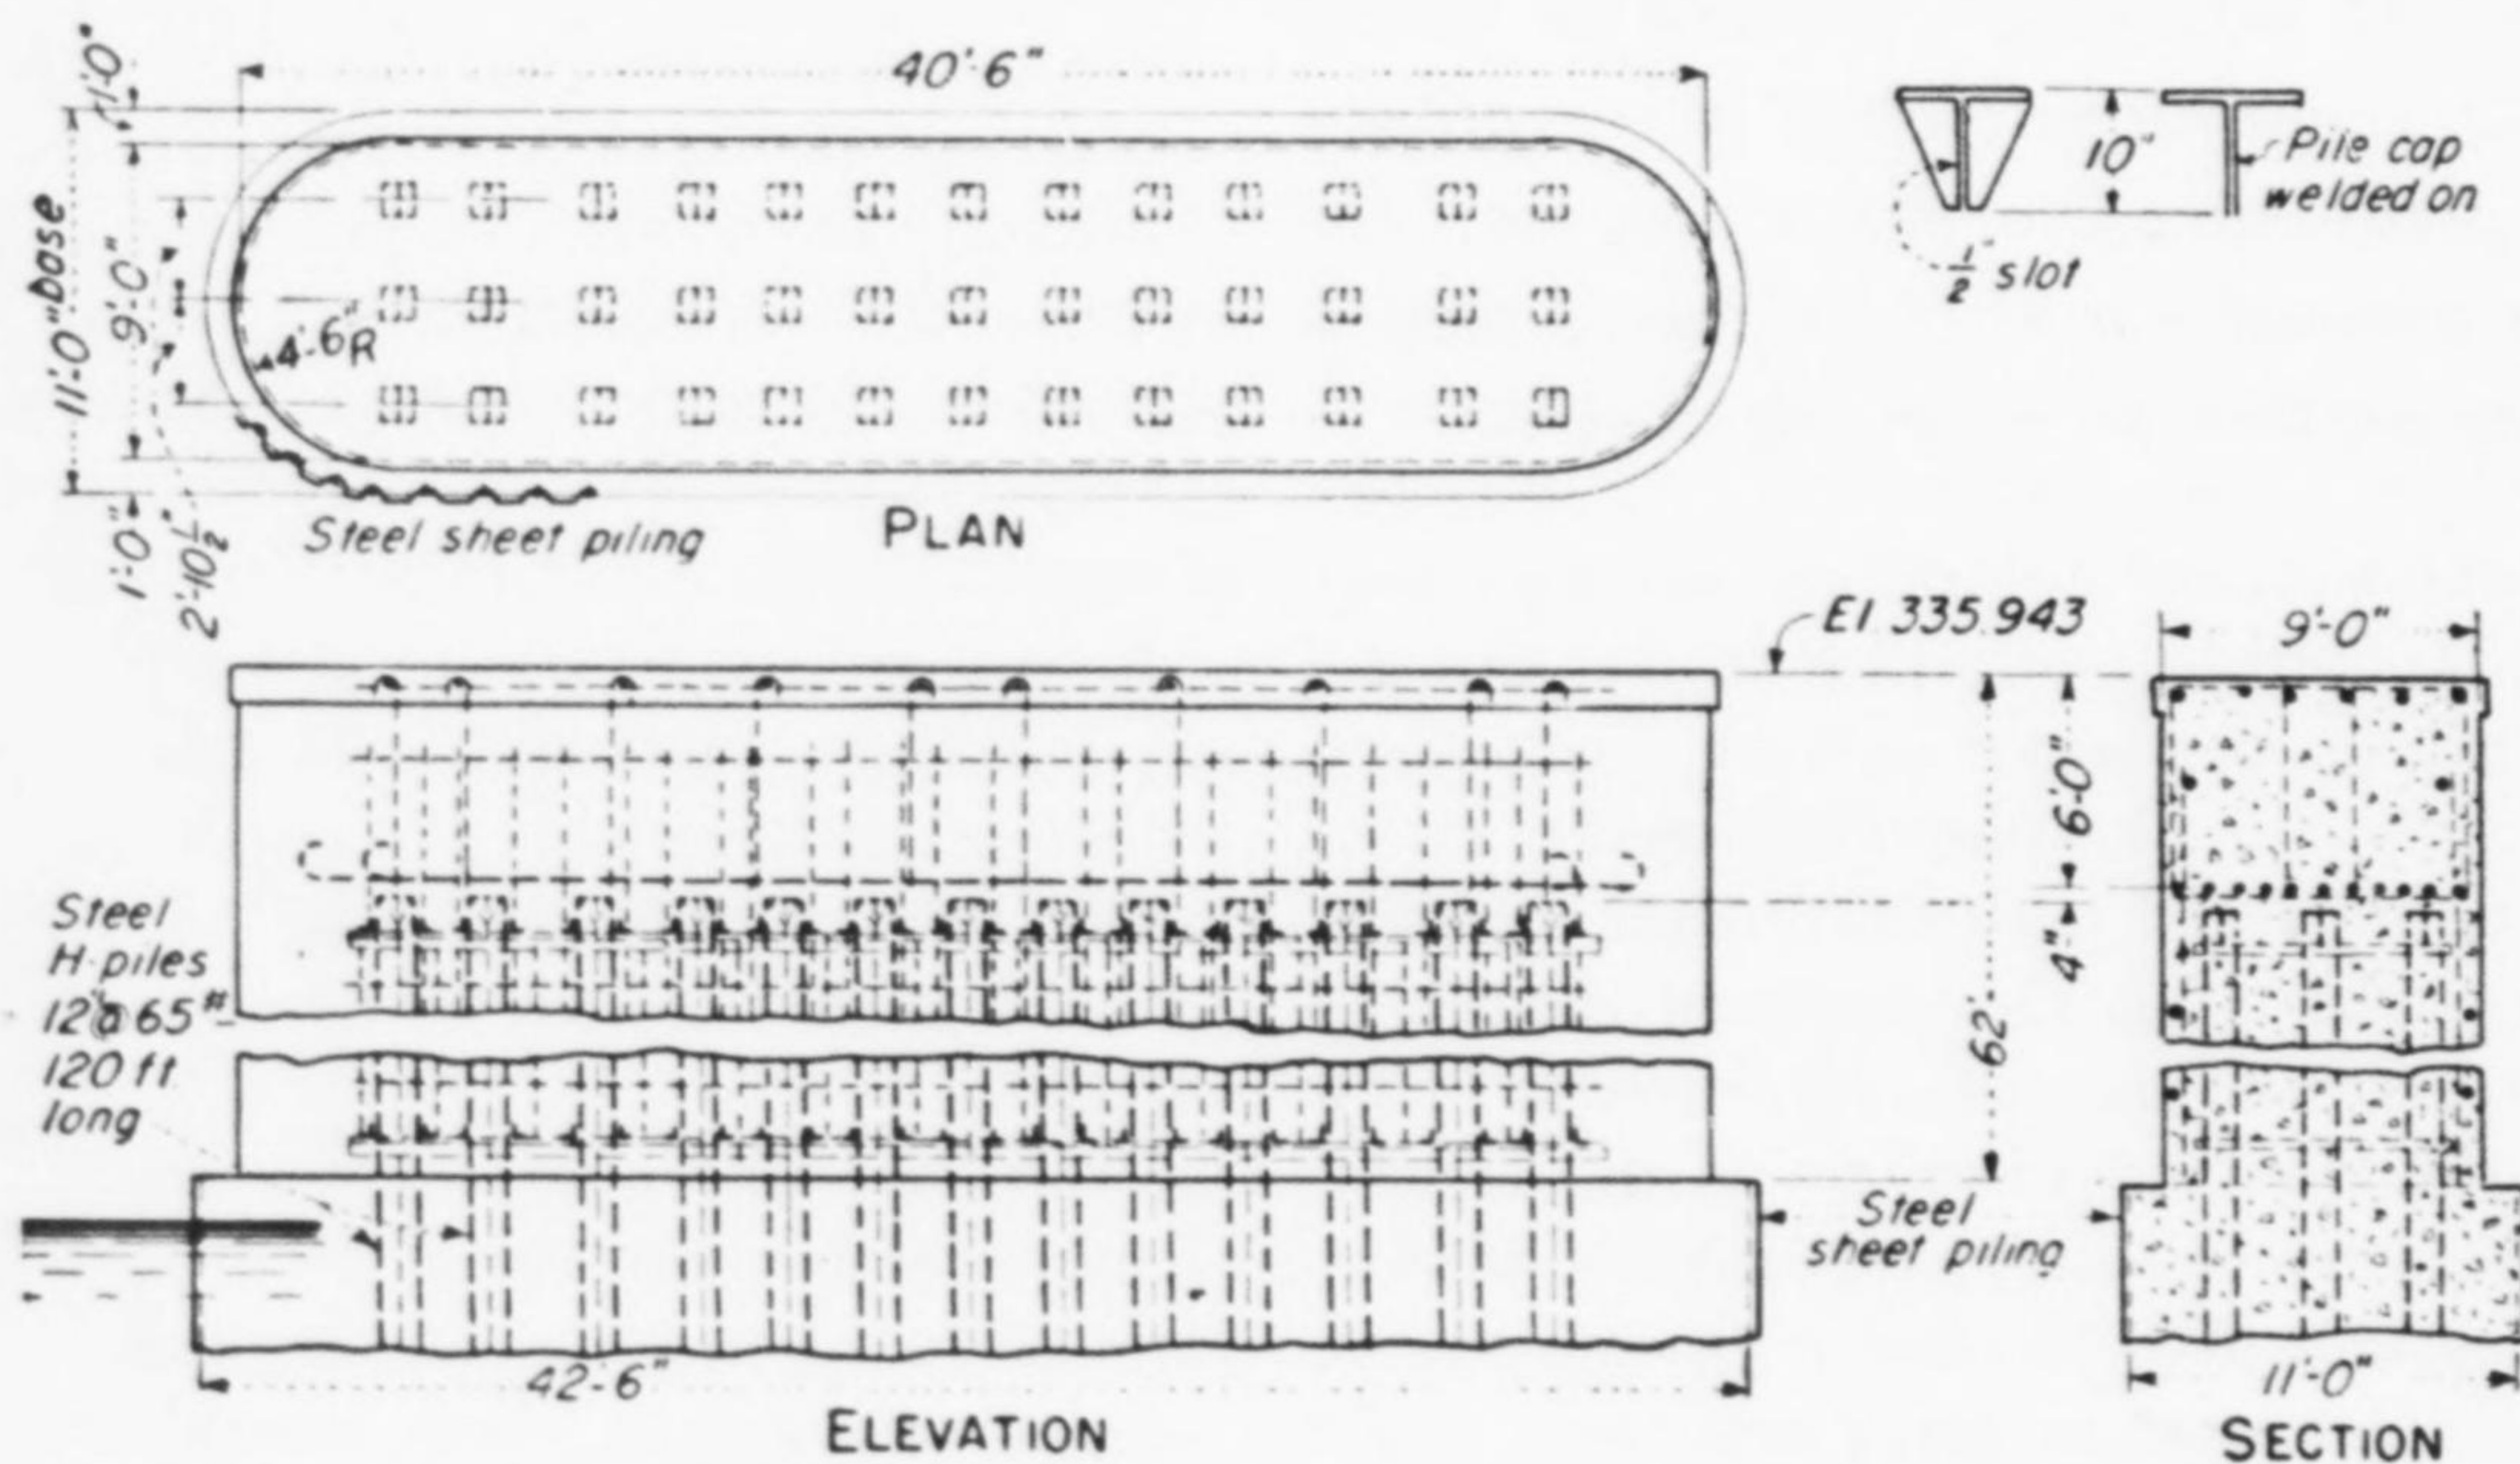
Details of piers 2 and 3. Encasement was made by filling with dry stone and forcing in grout under pressure.
